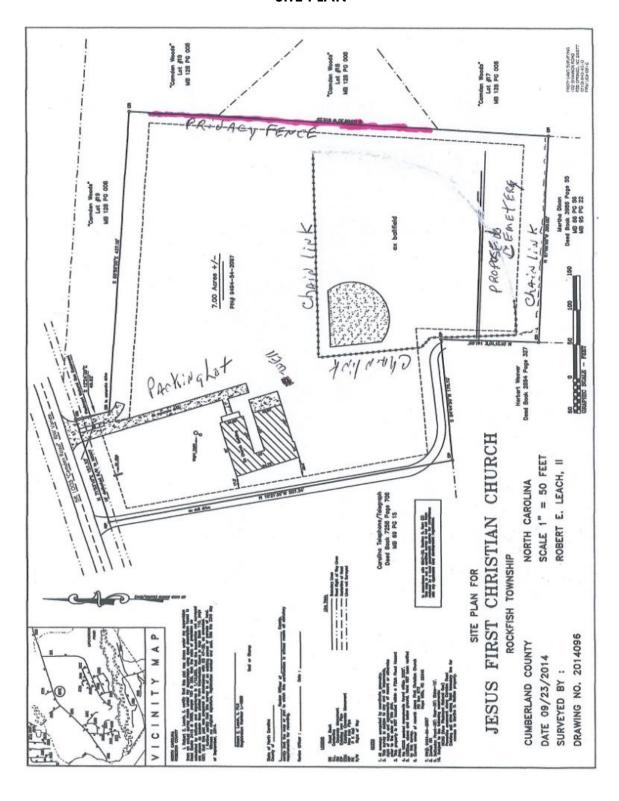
PROPOSED AREA OF THE CHURCH CEMETARY
